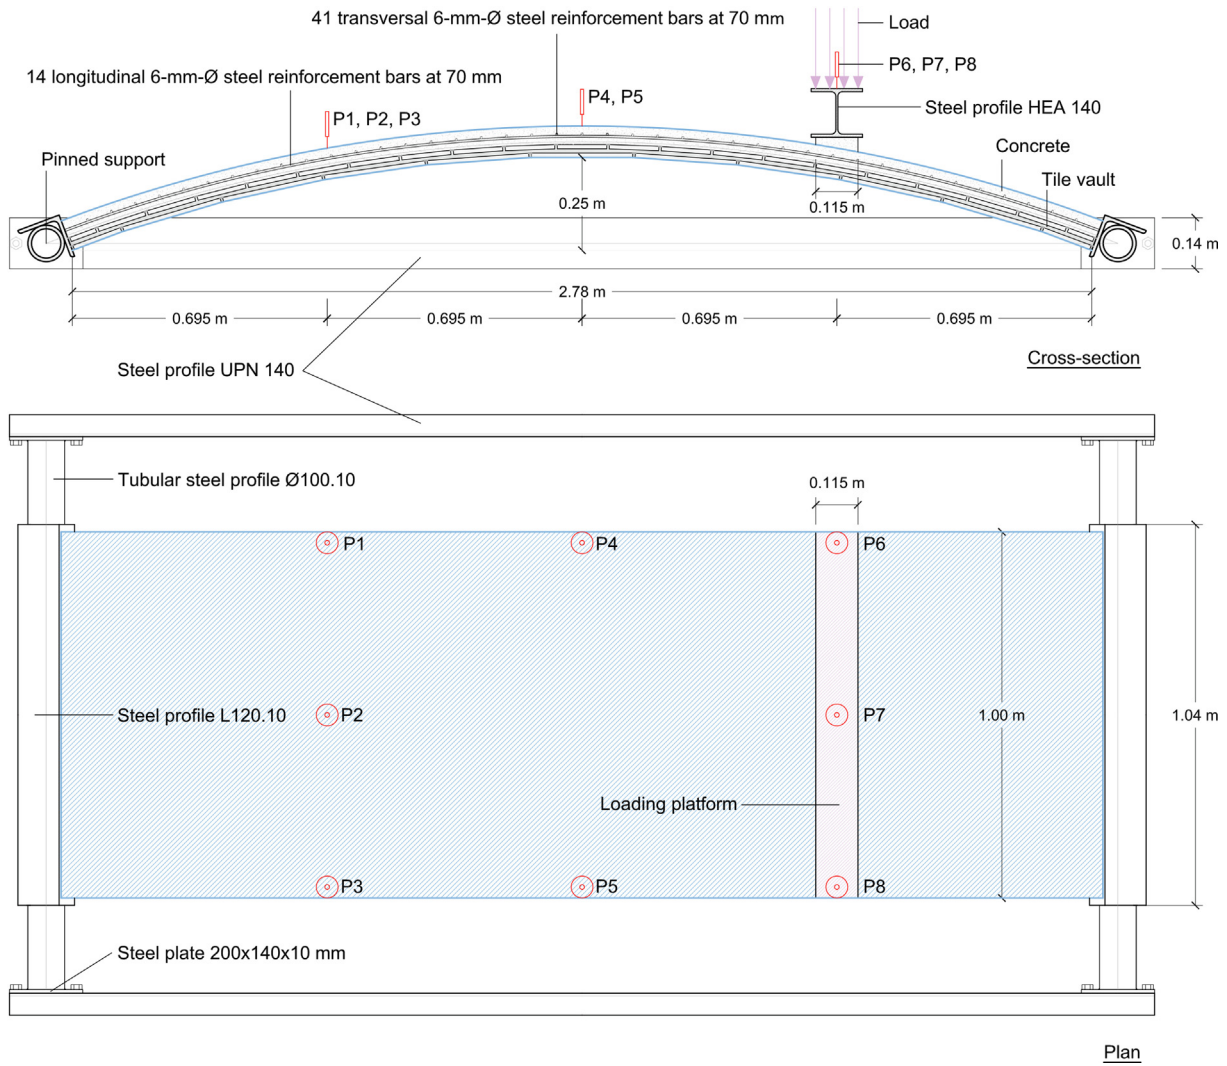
Setup of the monitoring and load test for the steel-reinforced composite barrel vaults. Potentiometers indicated as P1 to P8. Up) cross-section, down) plan.
